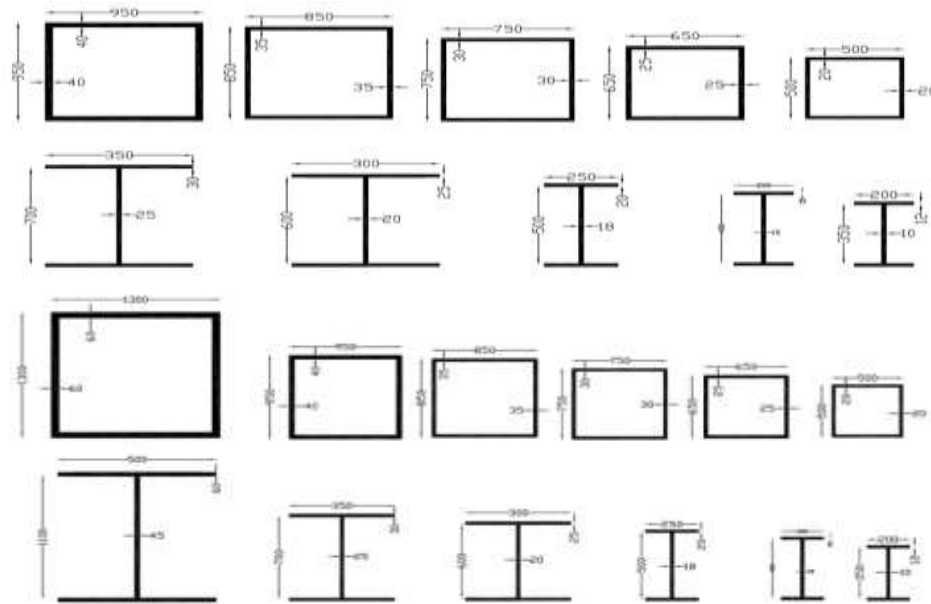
Dimensions of columns and steel beams used for buildings of 20, 40, 60 floors.
